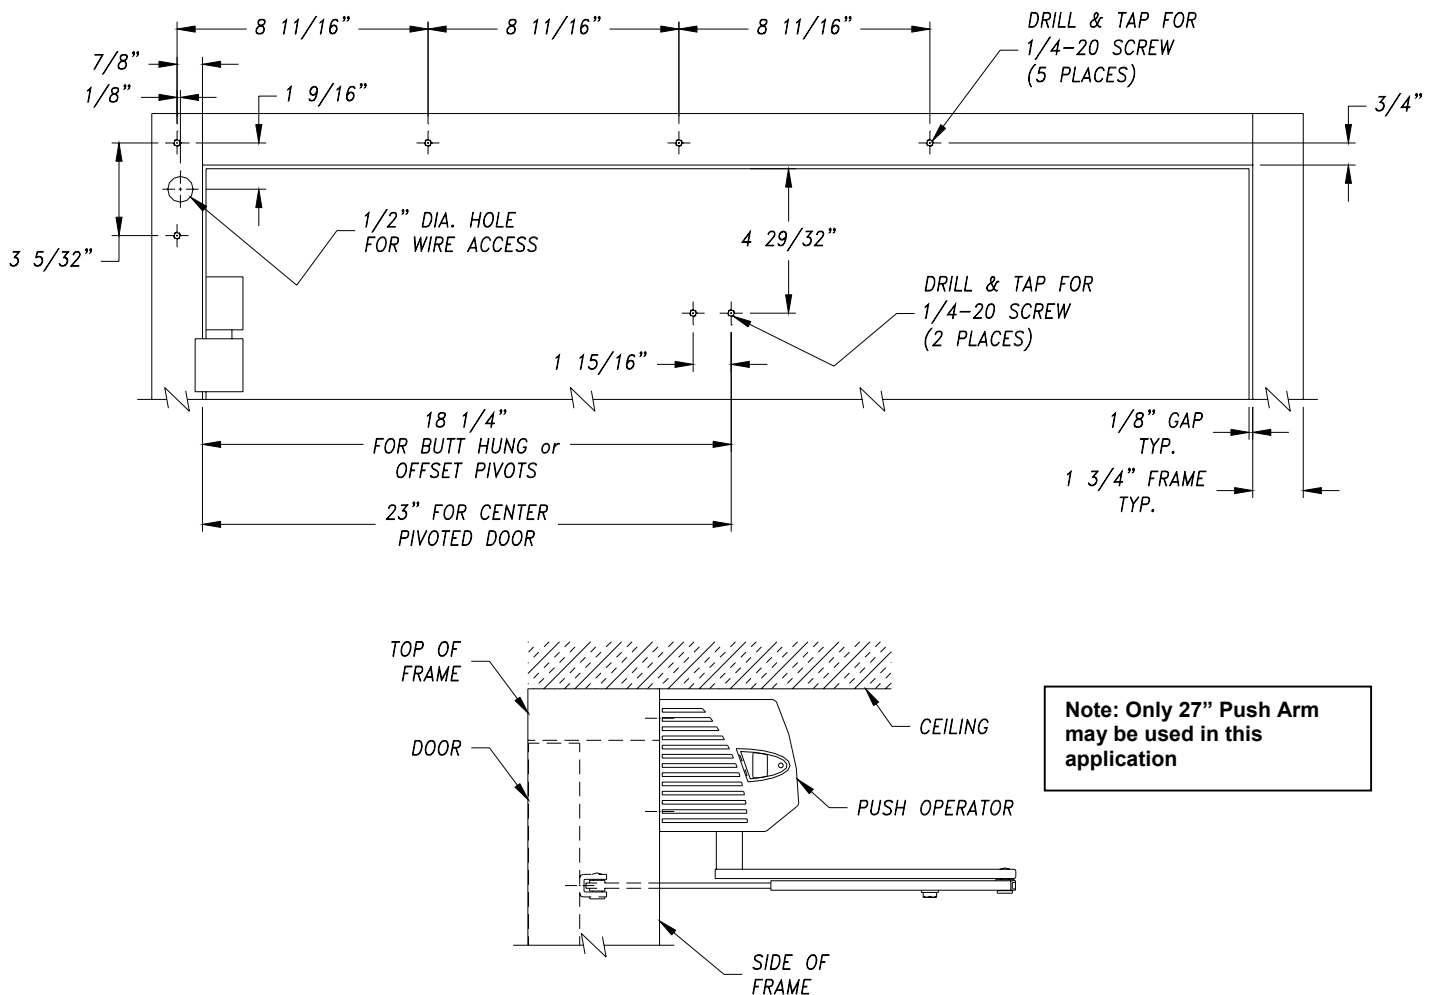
INSTALLATION TEMPLATE FOR LOW CEILING APPLICATION – PUSH ARM ONLY
